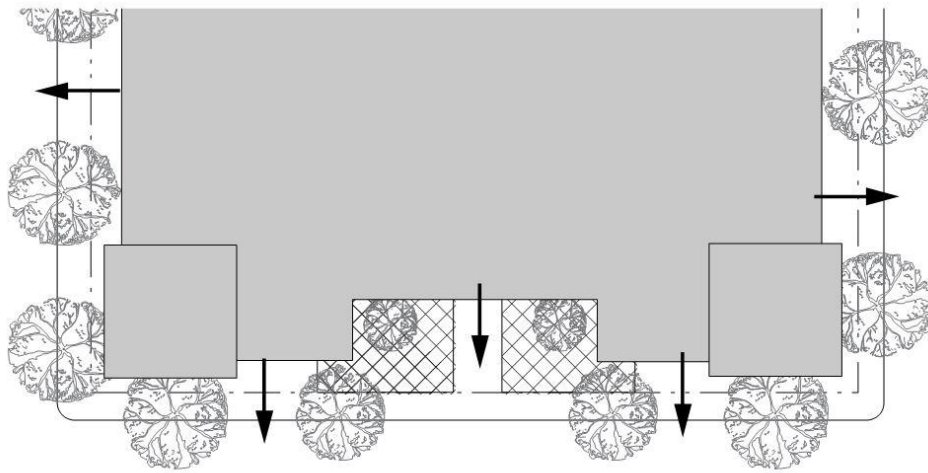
F.2: SIDEWALK CONNECTIONS
